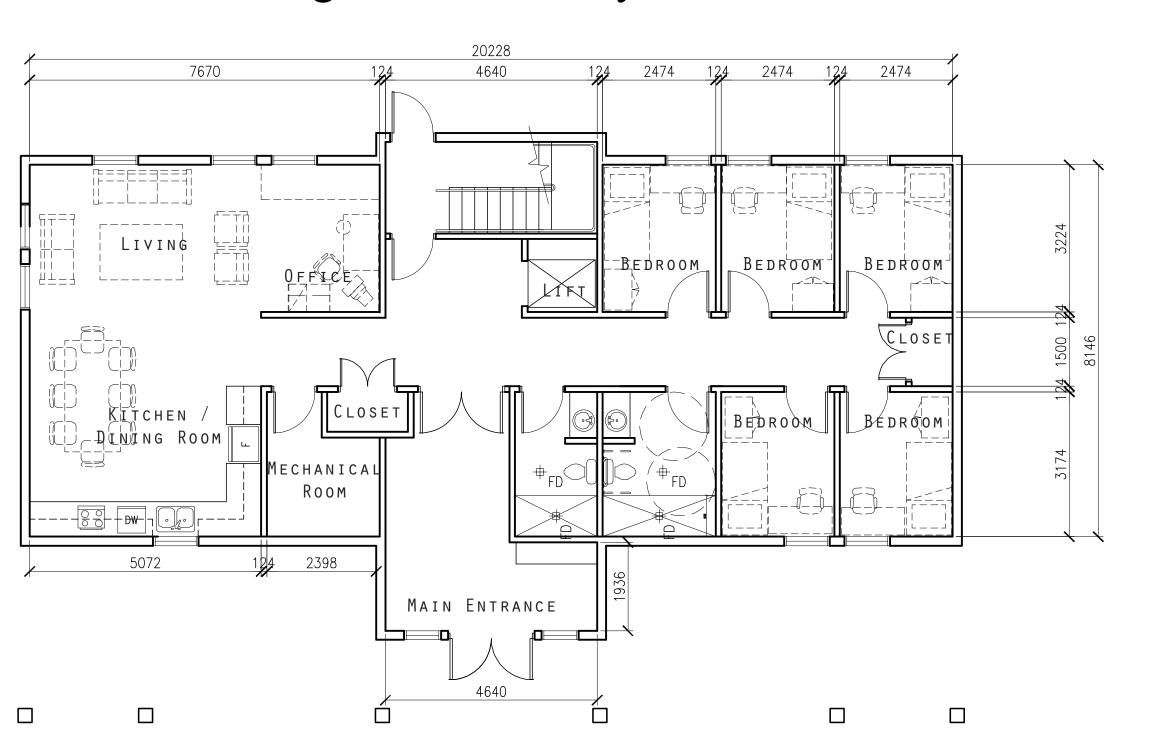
Floor plan of AUGO II ground floor. Up to nine persons (comfortably up to six) can be accommodated. A wheelchair accessible ramp leads up to the main entrance, while stairs and an elevator lead to the second floor.
